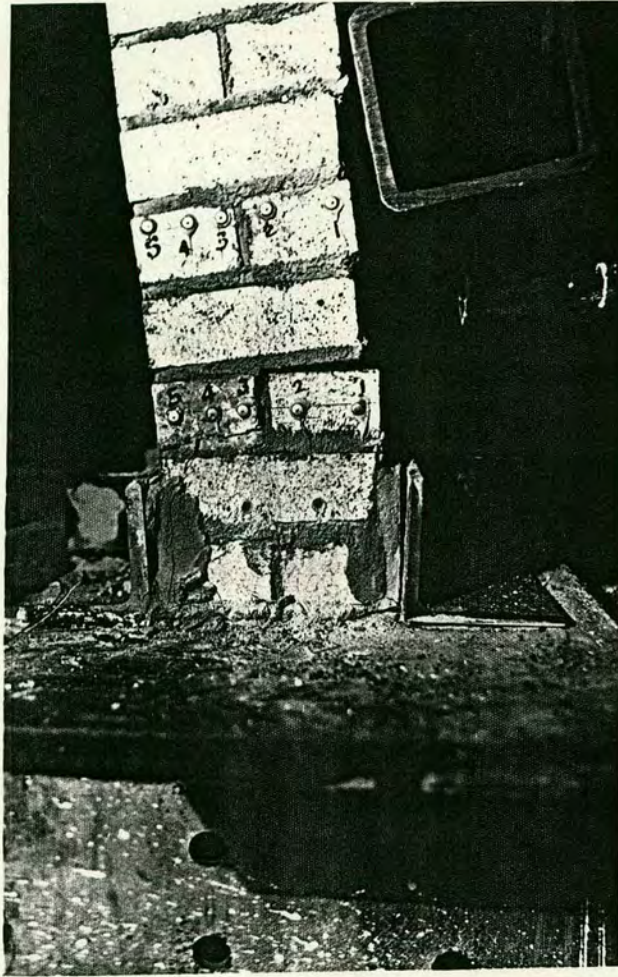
Typical failure mode and crushing of the brickwork at the base for over reinforced walls.
